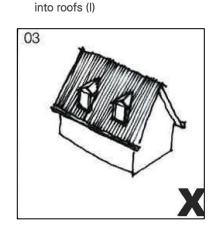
m: Tiled roof forms are strongly discouraged (I)
